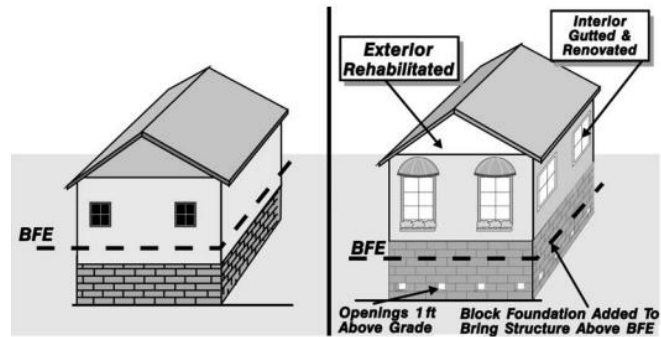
Structure Elevation (Source: FEMA NFIP Unit 8)
